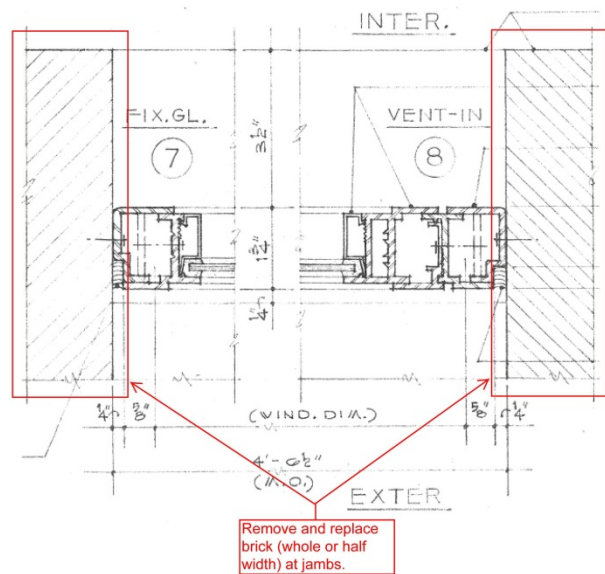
Horizontal details at Type 'B' windows indicating PCB Remediation Wastes to be removed. [From 1968 Drawing A-20]
